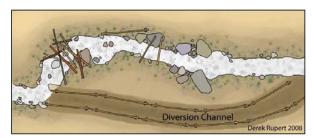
The diversion channel will be constructed by excavating a trench, building side walls, and installing a liner.
